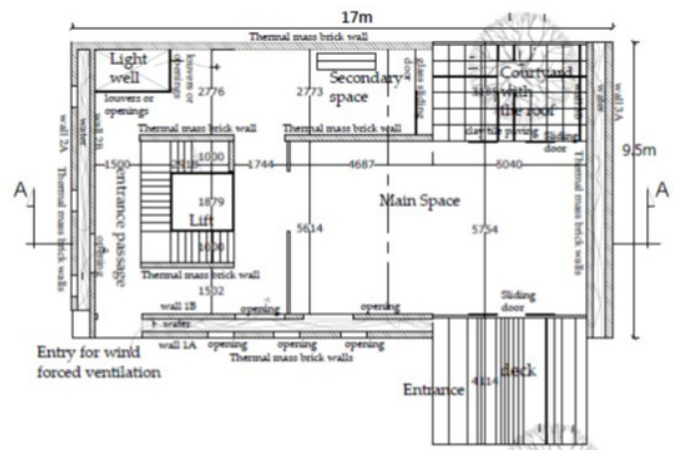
Conceptual improved rectangular building form, shorter facades orientated E/O, double skin envelopes, openings for night ventilation (source: Rajapaksha,U., Department of Architecture, University of Moratuwa, Sri Lanka)
